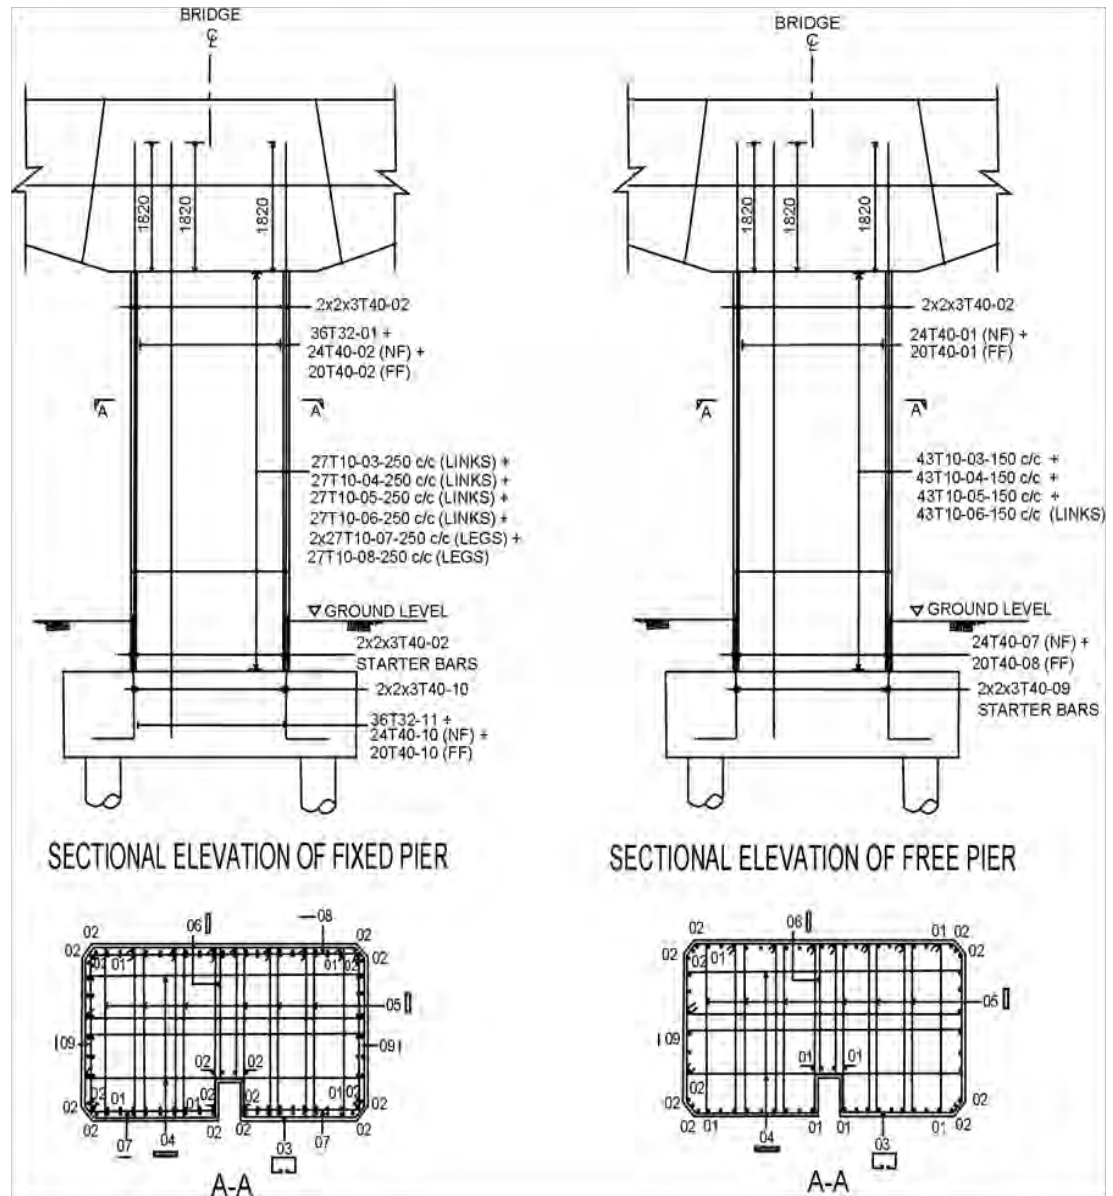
Sectional detailing of piers. Fixed piers have higher amount of longitudinal bars as that in free piers.
